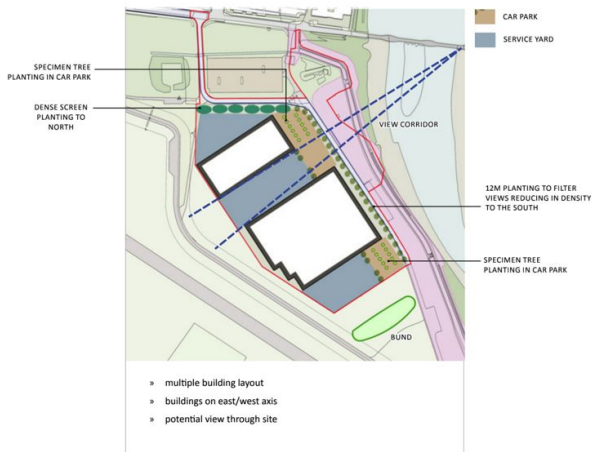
Diagram - Multiple Building Layout : Two Buildings
